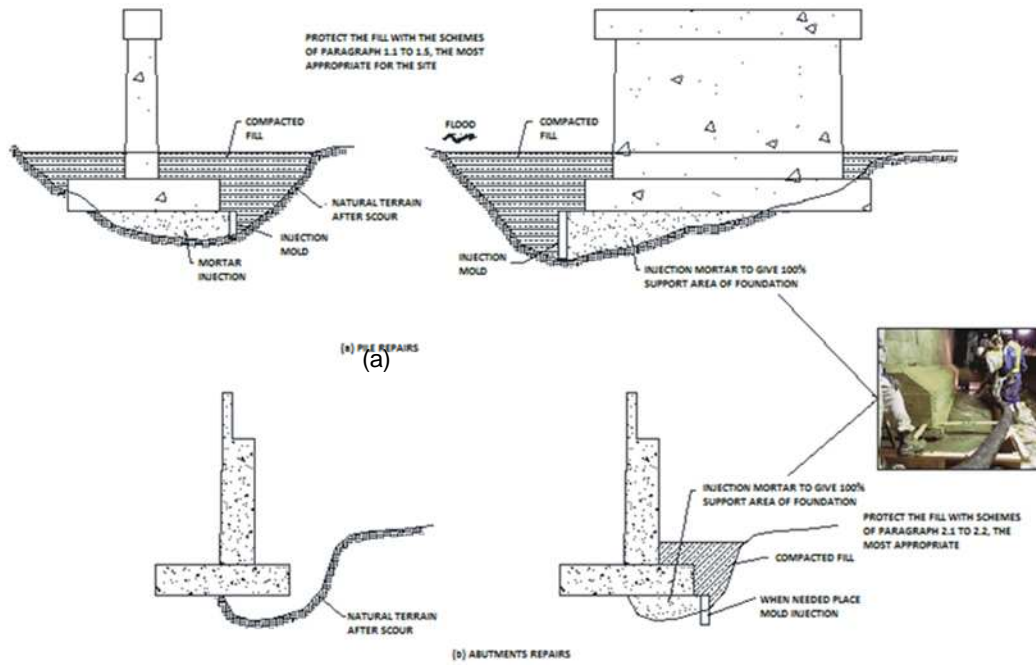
proposed repair method for direct foundation in (a) abutments and (b) piles. (SPOP, 2014)
